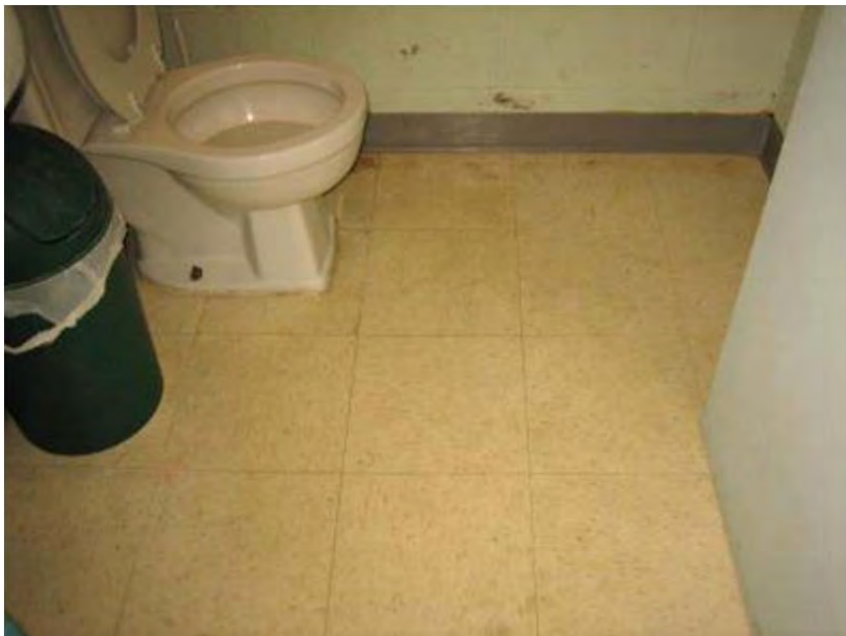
12"x12" floor tile in restroom of nail salon, 2nd layer flooring is ACM.
